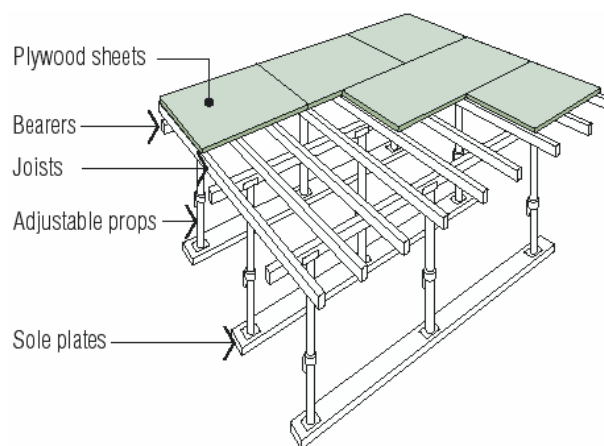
Typical soffit forms and falsework (diagrammatic only, bracing not shown)
